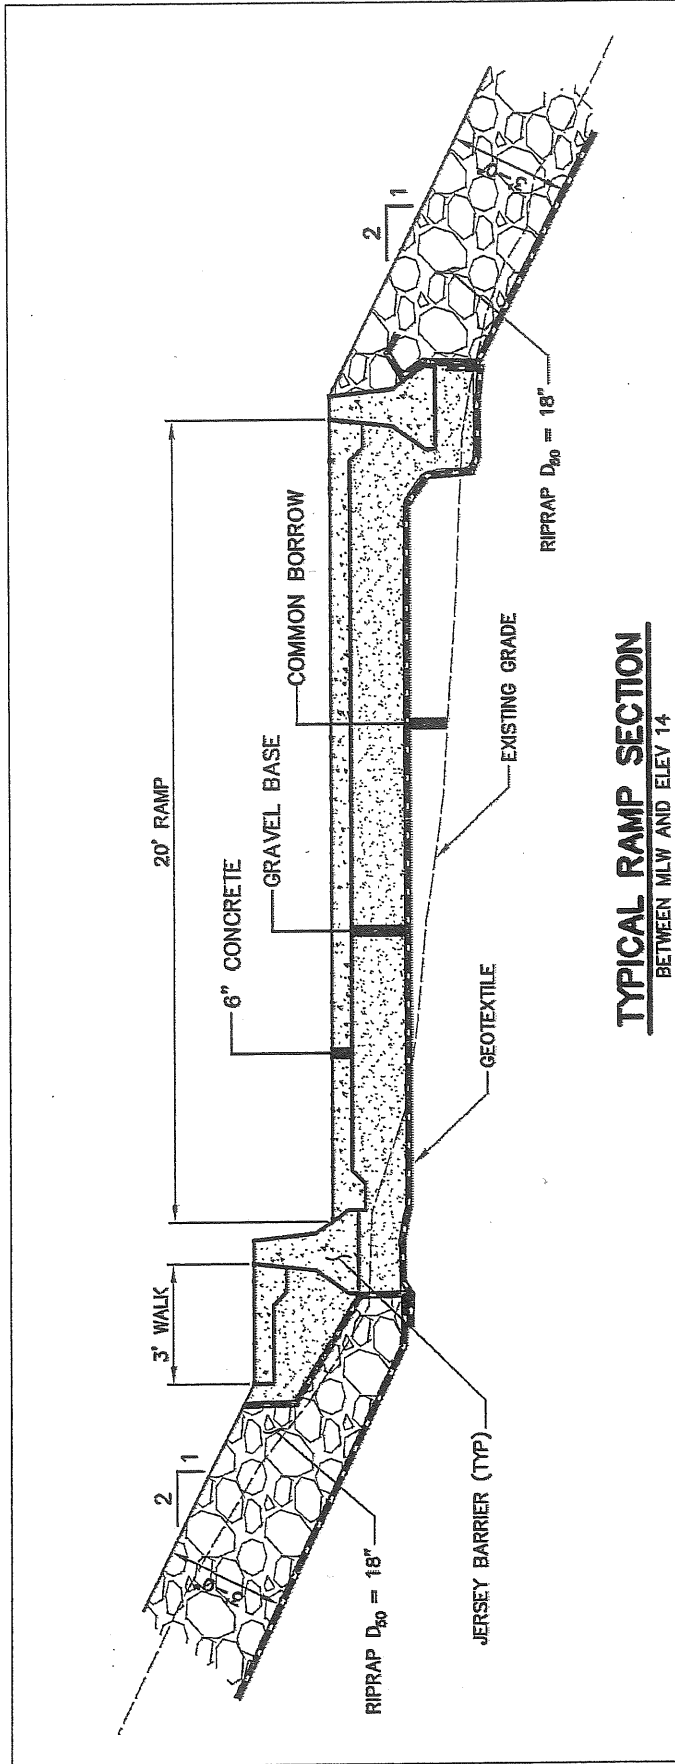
BOOK: 1507 7026	PAGE: 126 187	LOCATION: CITY OF PORTLAND CANAL LANDING	PROPOSED ACTIVITY: BOAT RAMP EXTENDING BEYOND MEAN LOW WATER ELEVATION AND FLOATING DOCKS	PROJECT APPLICANT: NEW YARD, LLC 58 FORE STREET PORTLAND, ME 04101
